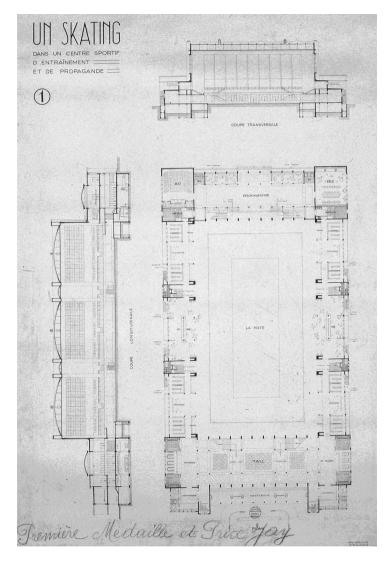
Ardilouze, "concours de construction générale" 1934: a skating rink in a sports training and advertising centere. Plan, cross and longitudinal section (BENSBA, CG - not catalogued)
